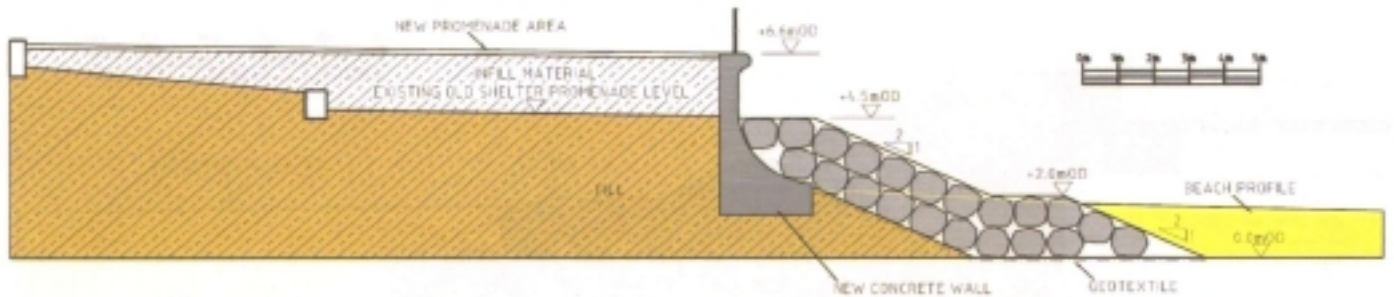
INDICATIVE CROSS SECTION OF ROCK ARMOUR, NEW SEAWALL AND FILL THROUGH THE FORMER NORTH SHELTER AREA.
